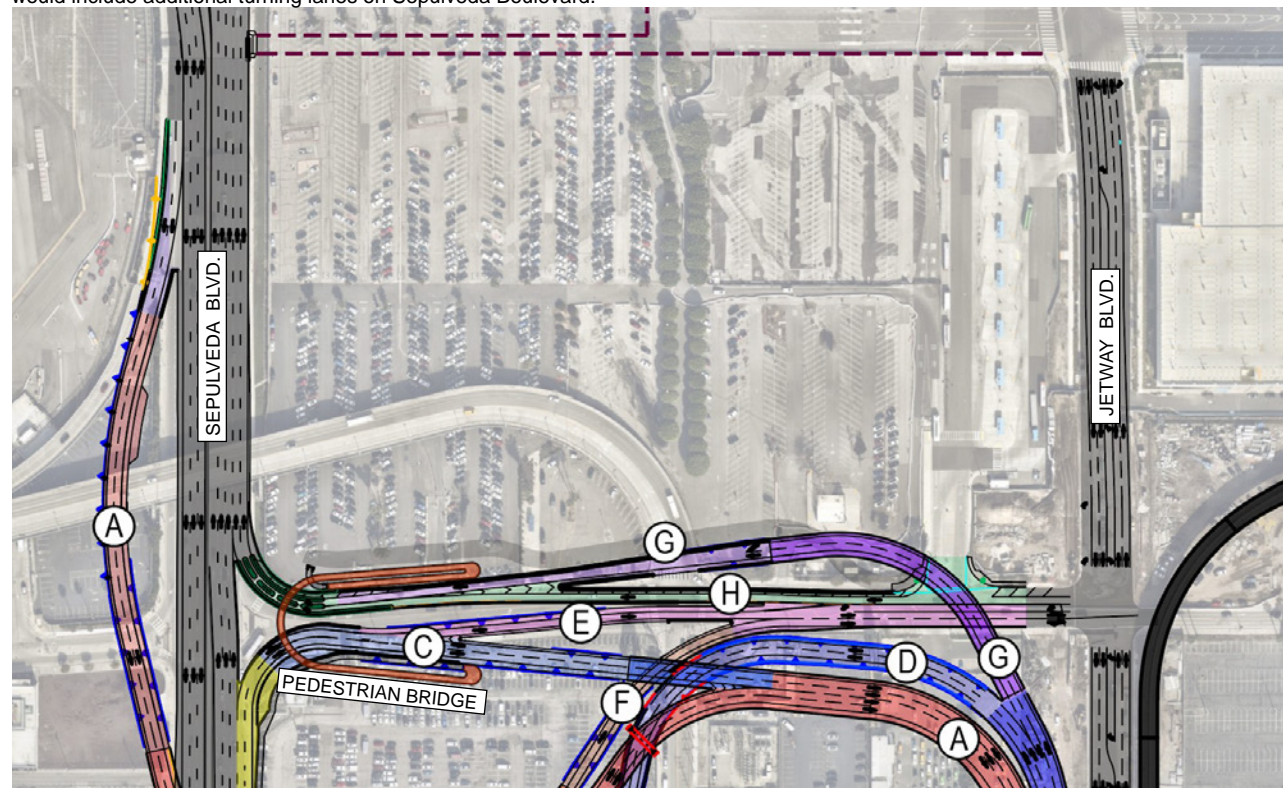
A pedestrian bridge would be added over 96th Street east of Sepulveda Boulevard.
